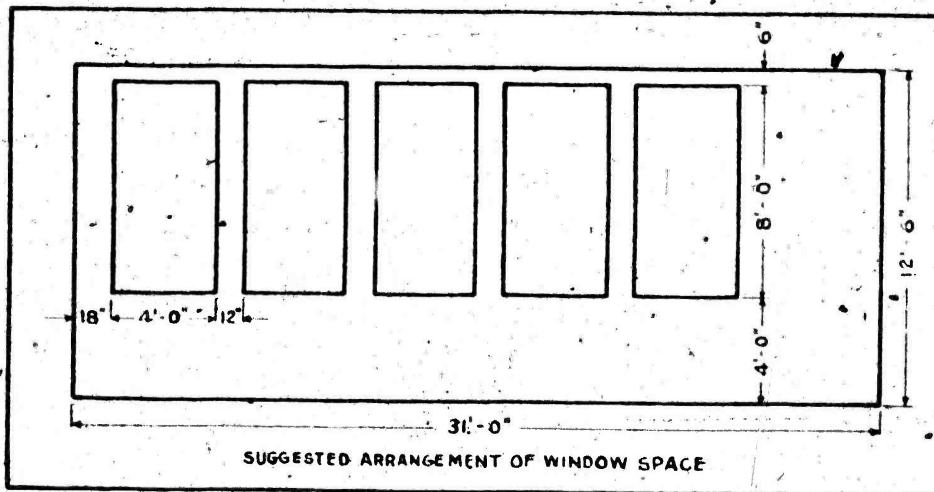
The windows in a schoolroom should be grouped as close together as possible, toward the rear of the room, with sills 4 feet above the floor level.
